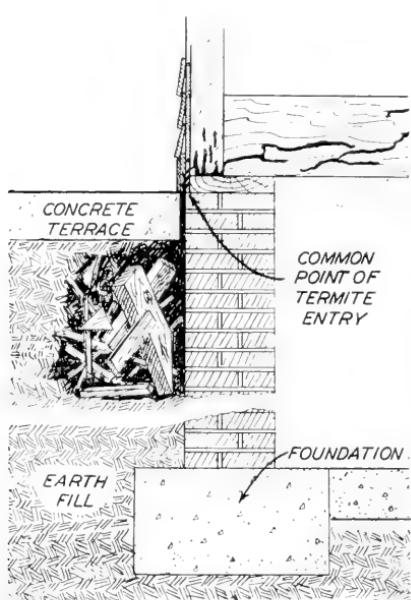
Earth-filled terraces provide a common source of termite attack. Waste wood covered with soil and kept moist by water seeping through a crack at point of union with foundation makes an ideal condition for termites, which attack the superstructure through the same crack as that which supplies the moisture. Conditions shown here should be contrasted with those in fig. 18.
